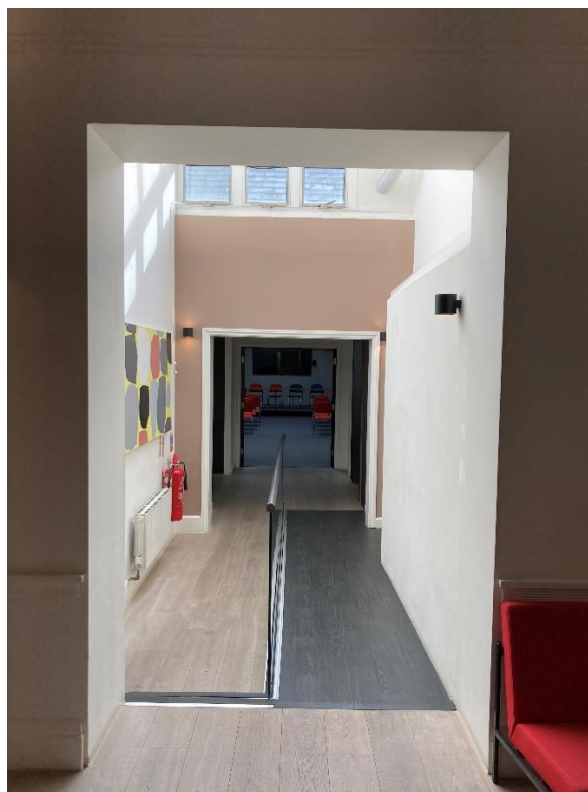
Existing ramp to modern extension home to conference facilities on ground floor of No.54 Doughty Street
